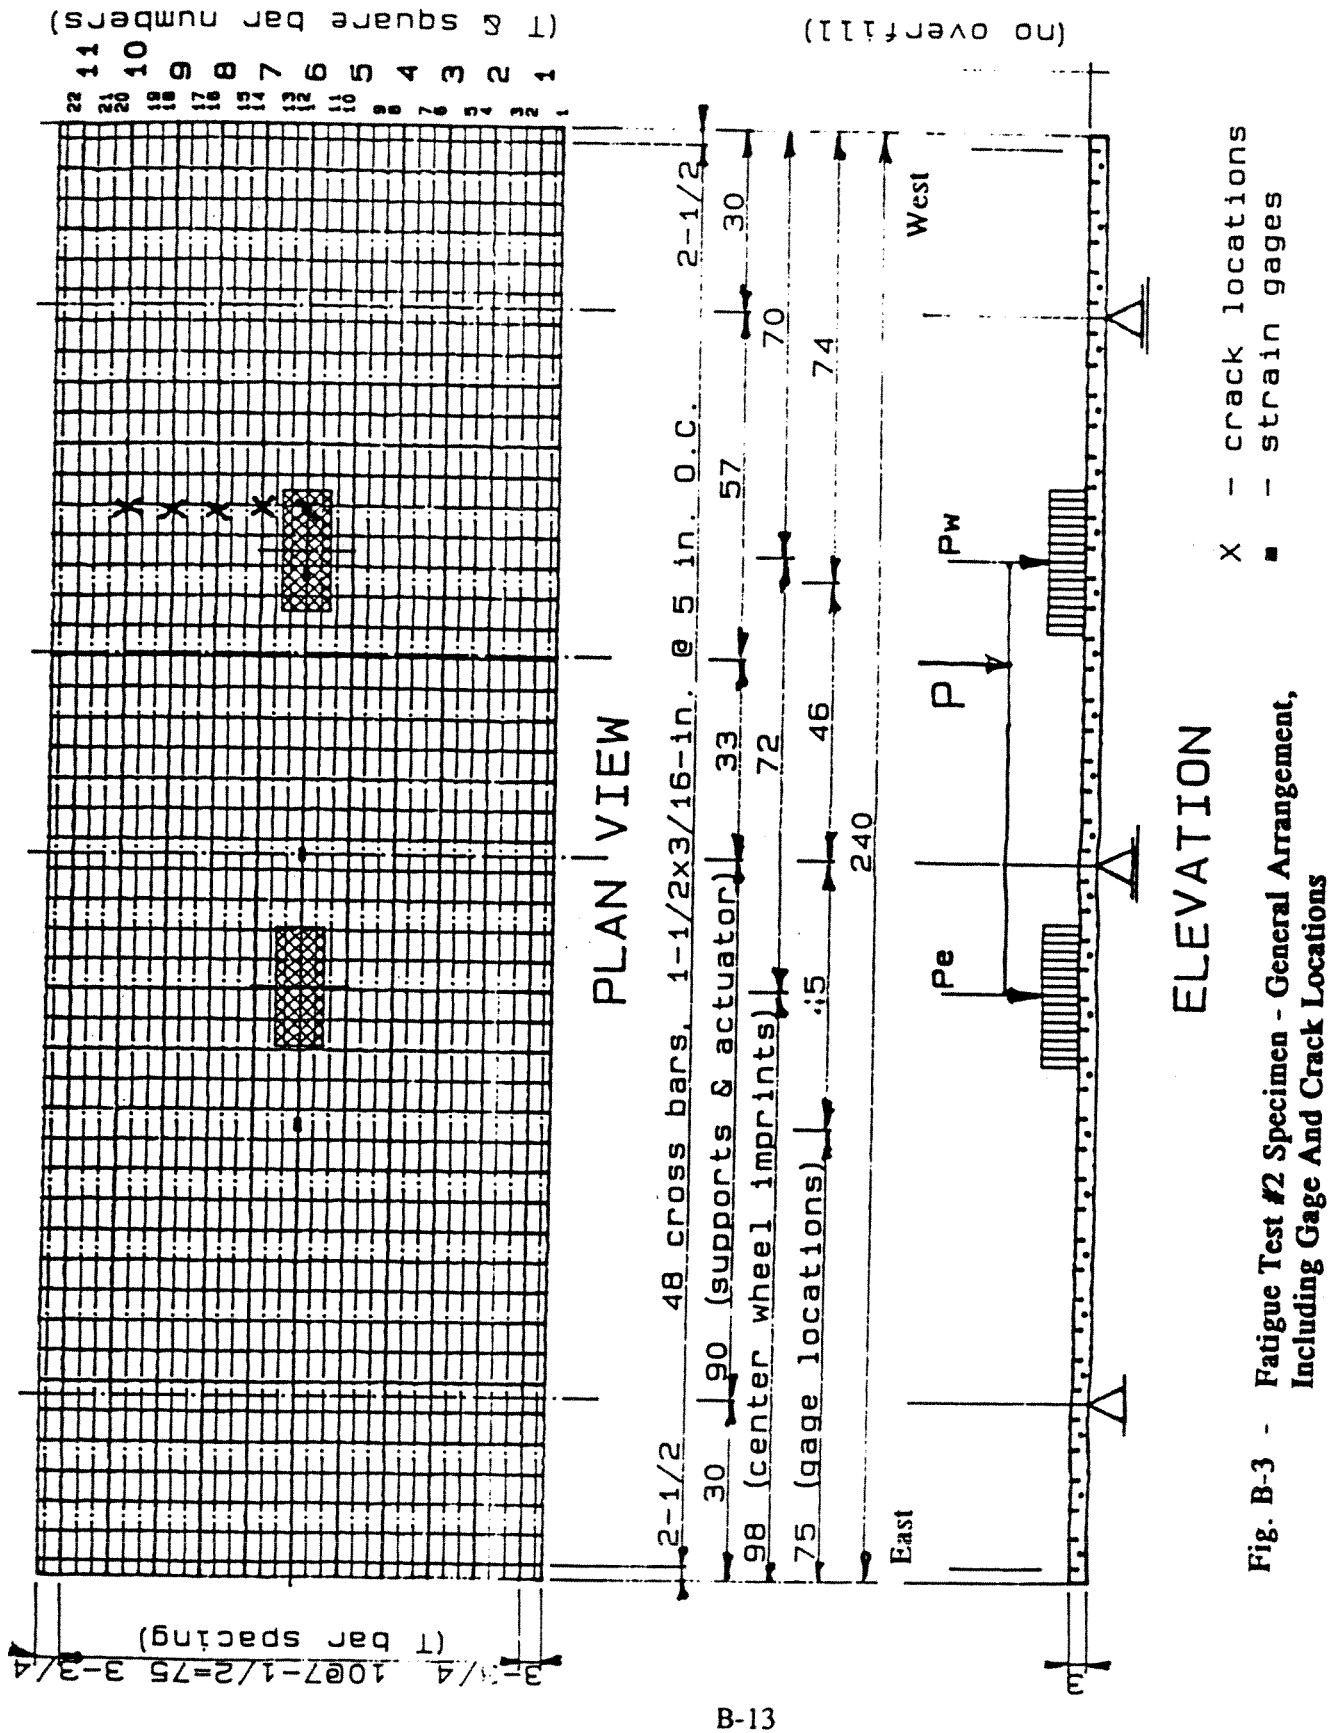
Fatigue Test #2 Specimen - General Arrangement, Including Gage And Crack Locations
